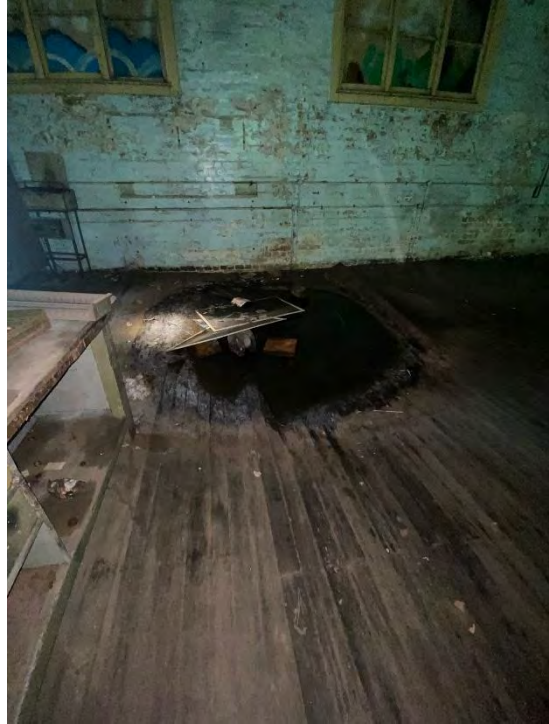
Water damage to original floorboards along the south eastern wall of the TEC in original workshop area (Source: Curio 2021)
